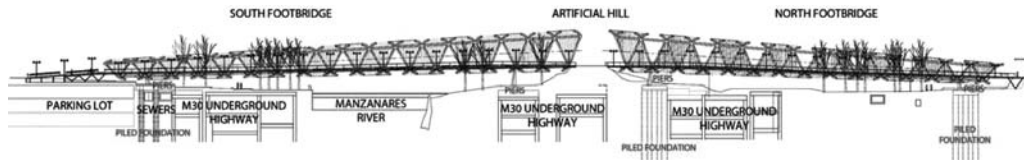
General cross section of the footbridge, showing the river and the complex underground distribution (underground highways, sewers and a parking lot), which greatly conditioned the design.
